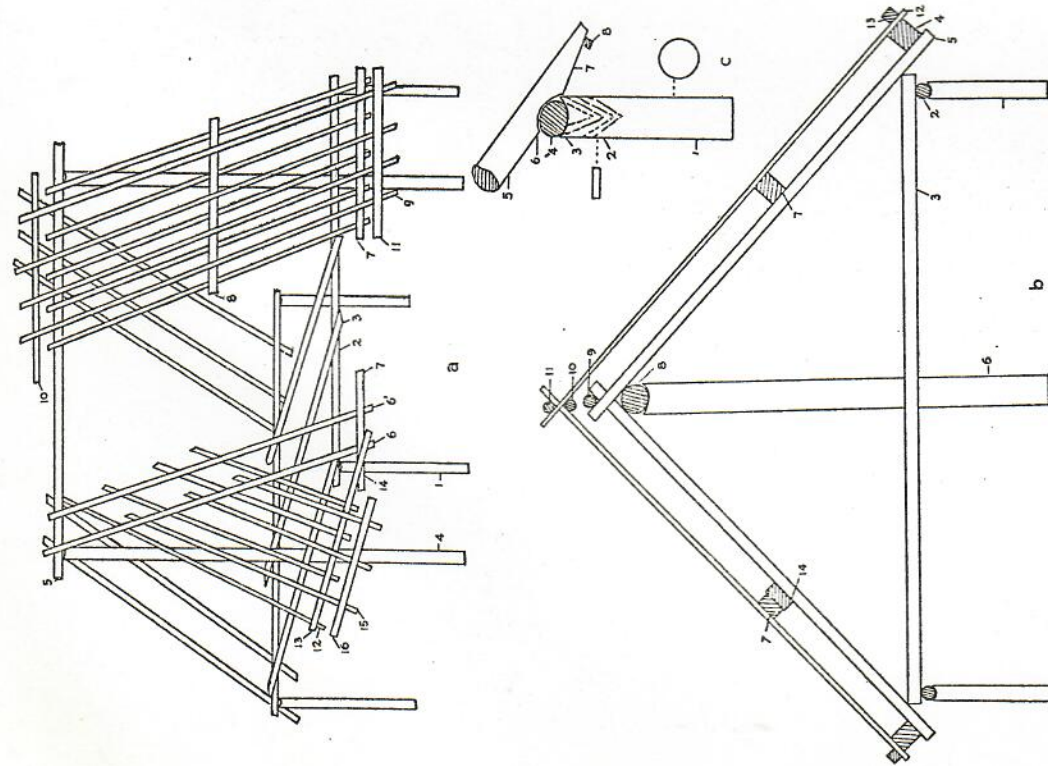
Ridgepole (*wale atua*) house. *a*, general features of frame construction: 1, wall post, supporting wall plate (2) on which rest tiebeams (3); ridgepost (4) passes upward on inner side of end tiebeam to support main ridgepole (5); principal rafters (6, 6') cross above ridgepole, and are lashed at lower end to wall plate and at upper end to ridgepole; eaves purlin (7) and midway purlin (8) lashed to principal rafters; thatch rafters (9) pass over purlins (7, 8) and support at top second ridgepole (10); another eaves purlin (11) lashed to lower end of thatch rafters; end principal rafters (12) pass to ridgepole and second side principal rafter (6') on each side of roof; end rafter eaves purlin (13) lies on bottom of end principal rafters, and is joined at side to side rafter eaves purlin (7) at point (14); end thatch rafters (15) pass over end purlin (13), and up to first side principal rafter (6) on each side; end eaves purlin (16) joins bottoms of end thatch rafters (15). *b*, end view: 1, wall post; 2, wall plate; 3, tiebeam; 4, rafter eaves purlin (*takihikihi*); 5, rafter; 6, ridgepost; 7, midway purlin, on left side widened by chock (*neinei*) (14); 8, main ridgepole; 9, second (rafter) ridgepole (*tauhua*); 10, third (rafter) ridgepole (*tautolu*); 11, fourth ridgepole (*nui monohi*); 12, thatch rafter (*kayo*); 13, thatch rafter eaves batten. *c*, detail of wall post and rafter: 1, wall post, round cross section, adzed at top to produce rectangular cross section 2; head of wall post grooved (*wakatu pou*) (3) to receive wall plate (4); principal rafter (5) grooved on inner side (*wakakamu*) at 6 to fit over wall plate; lower side of rafter flattened (*pa*) so that eaves purlin (8) will fit closely.
